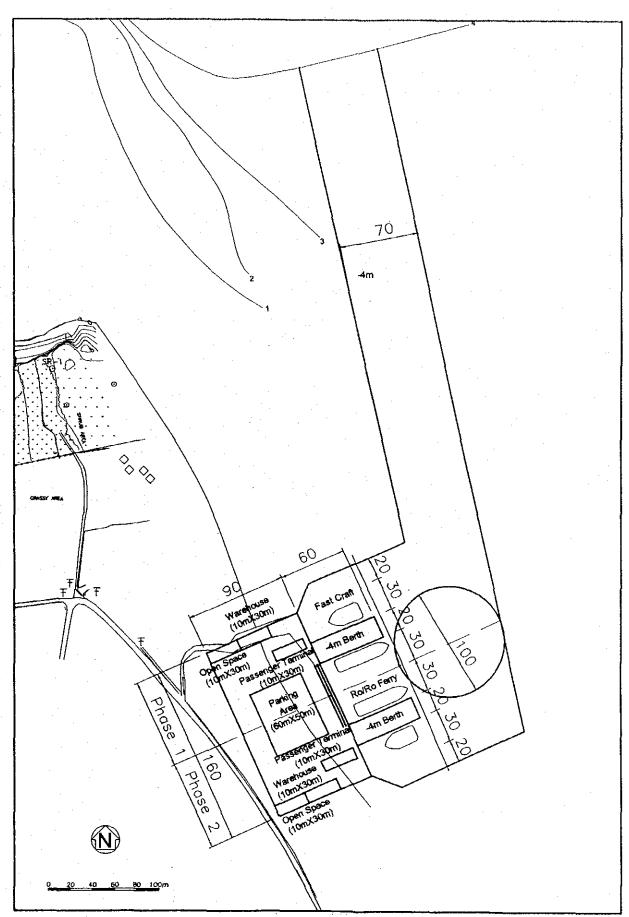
The New San Remigio Port Master Plan 2
